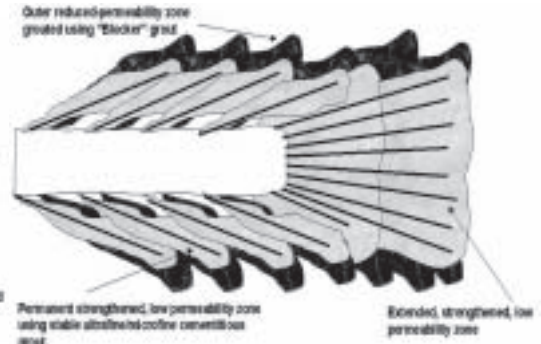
Post-grouting with BG to prevent grout from flowing back into the tunnel
